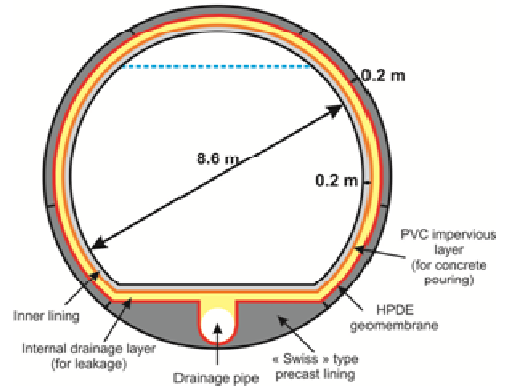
Typical Tunnel Lining Details (Conveyance Alignment 220.1)
